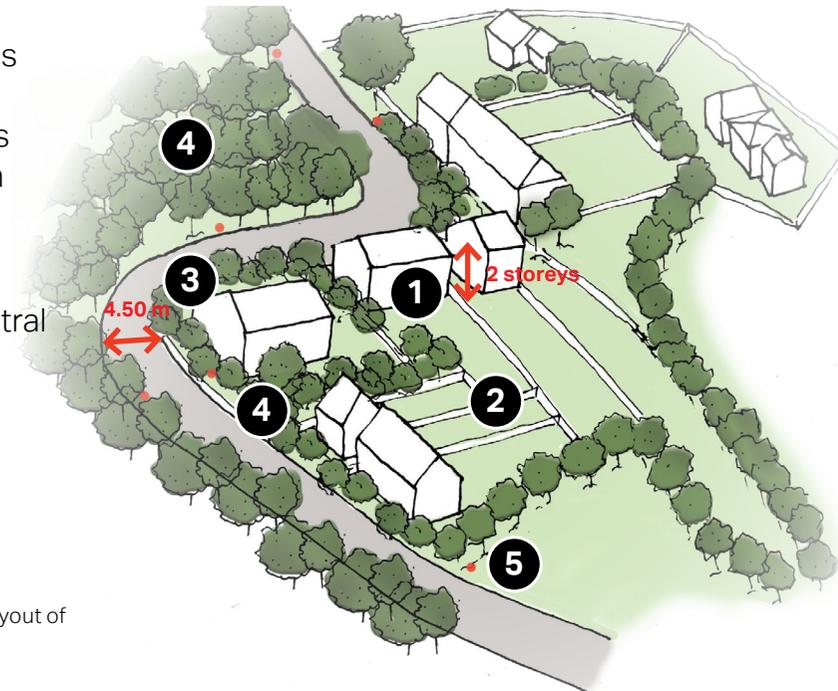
Illustrative plan for a rural edge development highlighting design elements, related to the pattern and layout of buildings.
